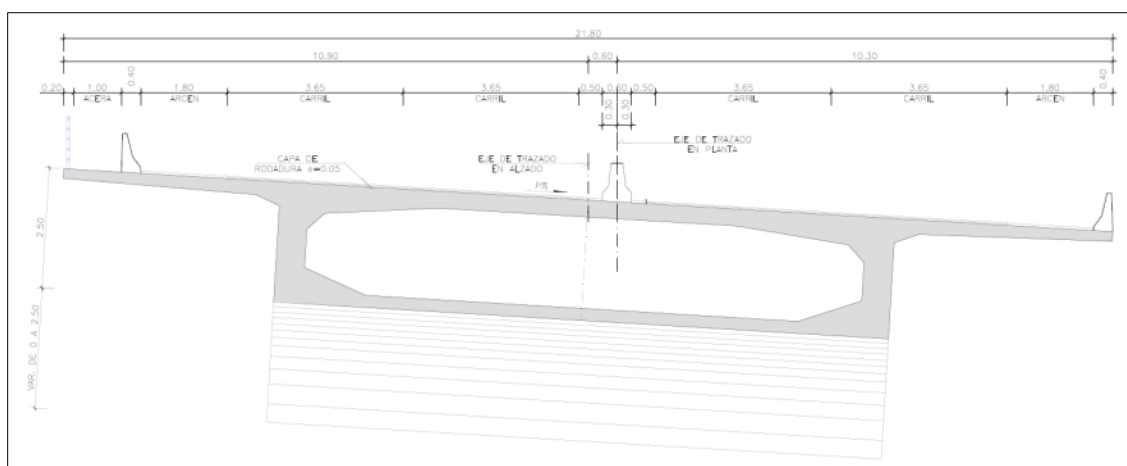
Elevation of the Sapuyes River Bridge.
